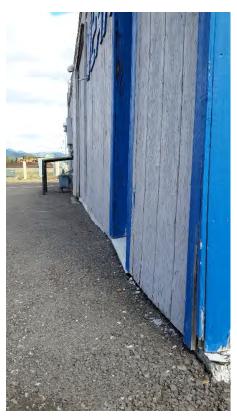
Building 13 - siding corner trim damaged, south east corner
